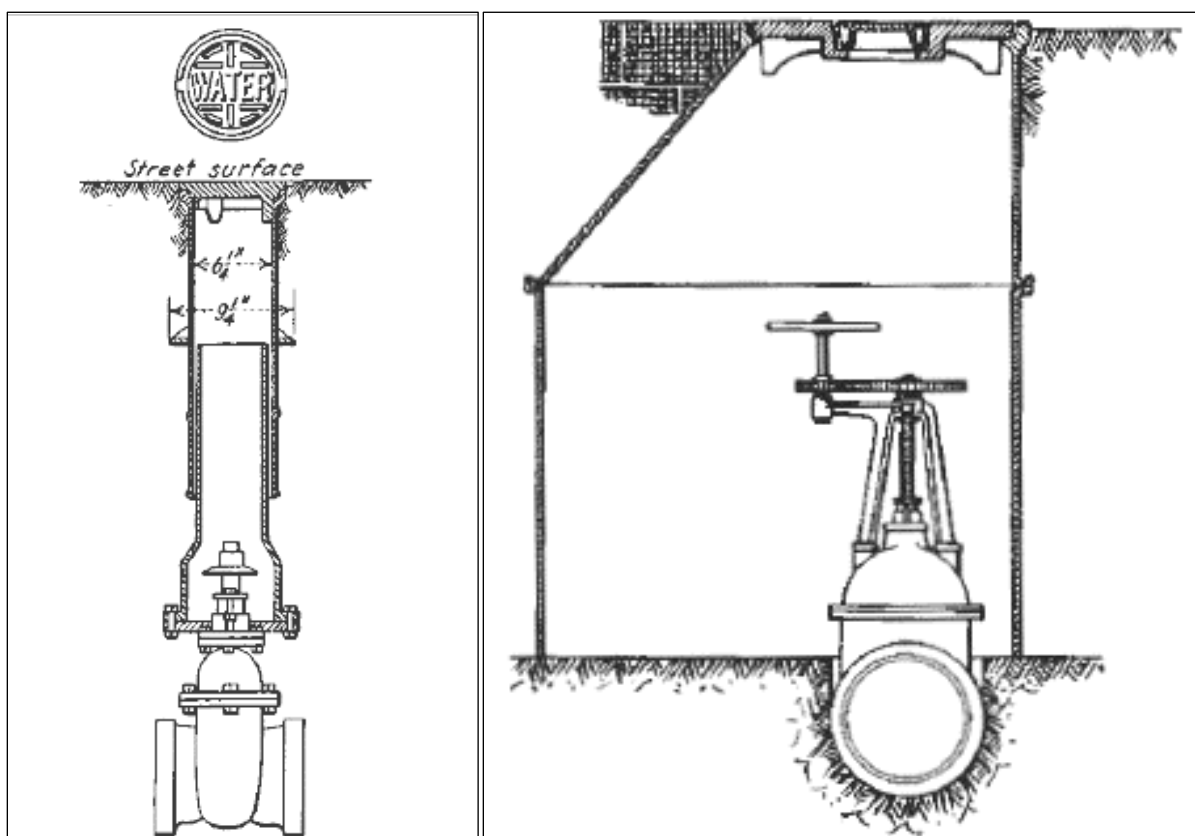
A small gate valve operated by turn key (left) and a larger valve with geared handle in cast iron vault.³⁴⁶
